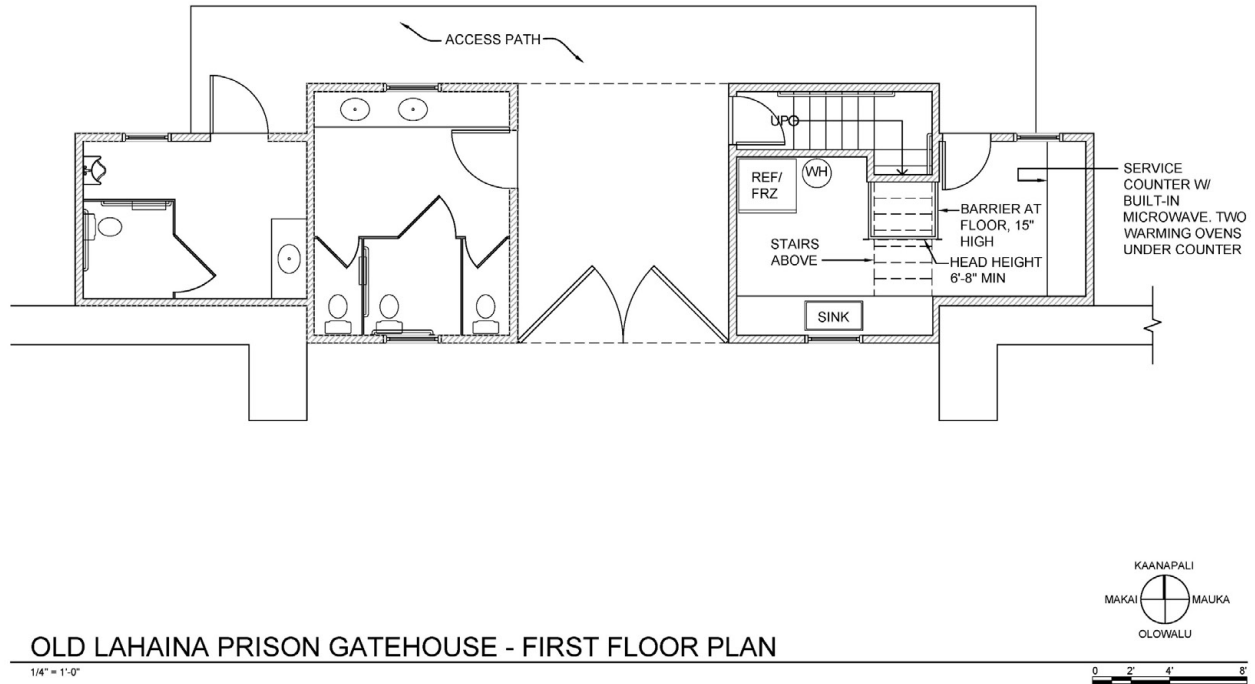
Old Lahaina Prison Gatehouse First Floor Plan.
